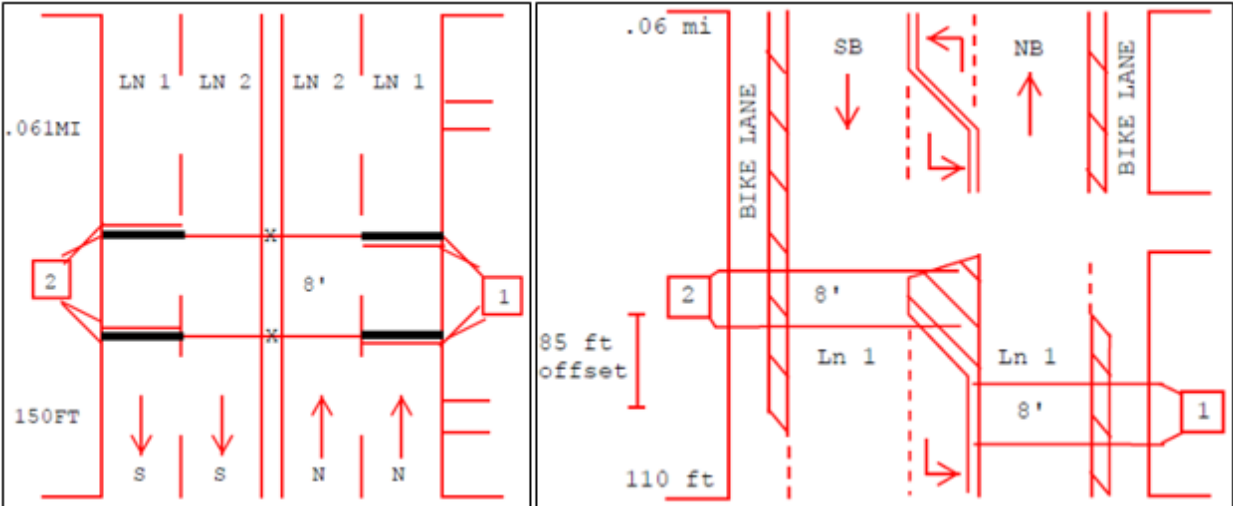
Schematics of Ridge Top Road Site 1 Data Collection Locations Before (Left) and After (Right) Road Diet. Images provided by The Traffic Group, Inc. Reprinted with permission.
